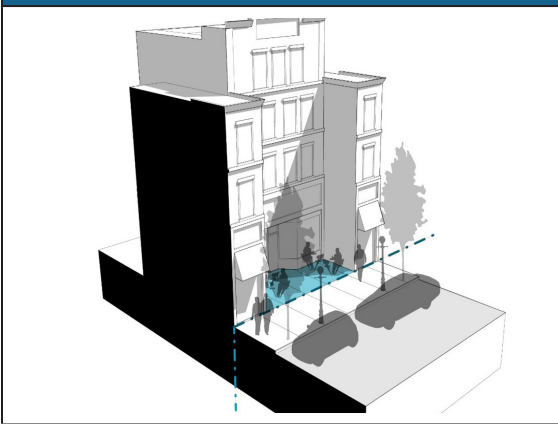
A - BUILDINGS SITED TO CREATE A STREET WALL
